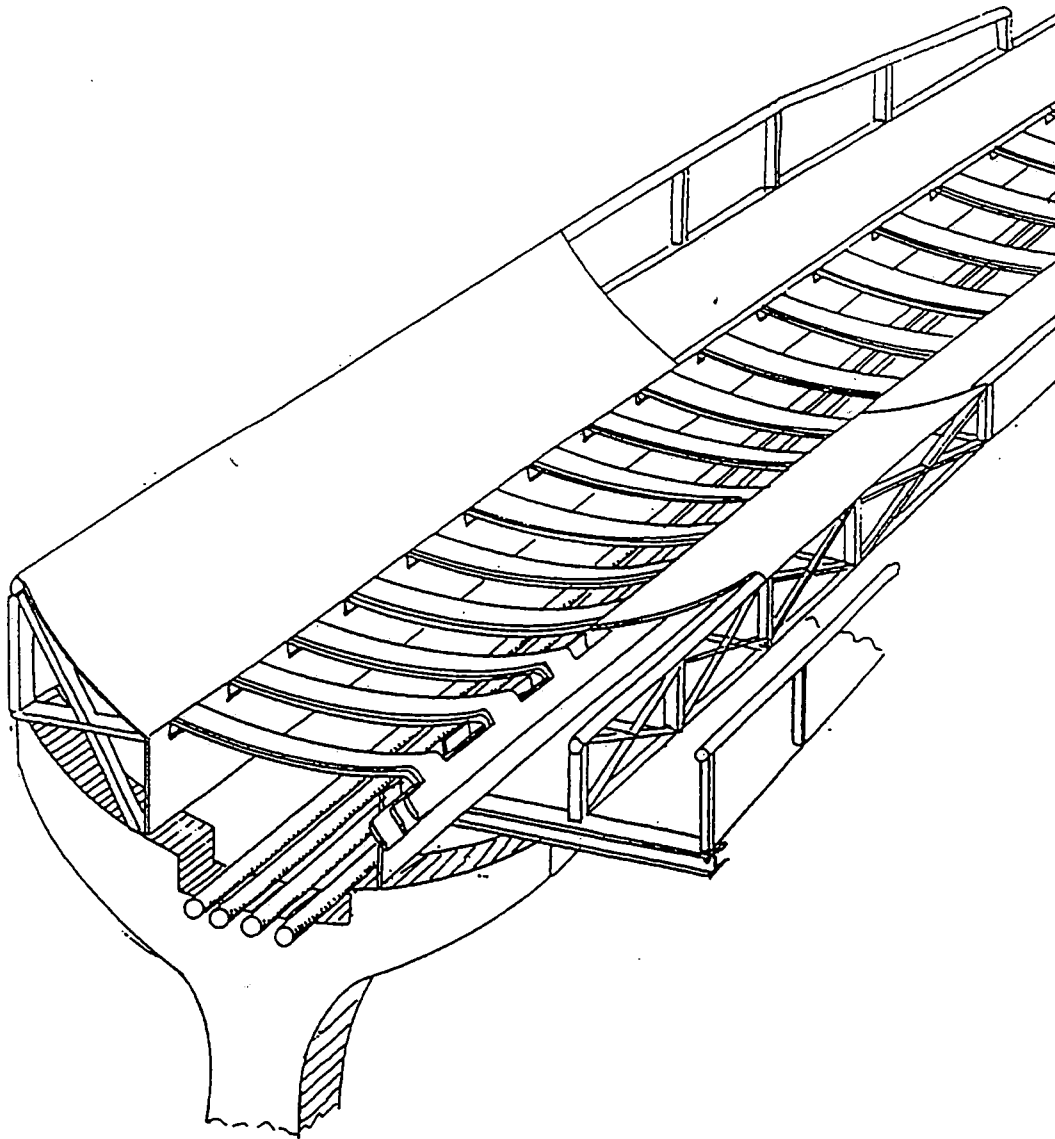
Isometric view of magway showing structure, LSM windings, and levitation sheet
